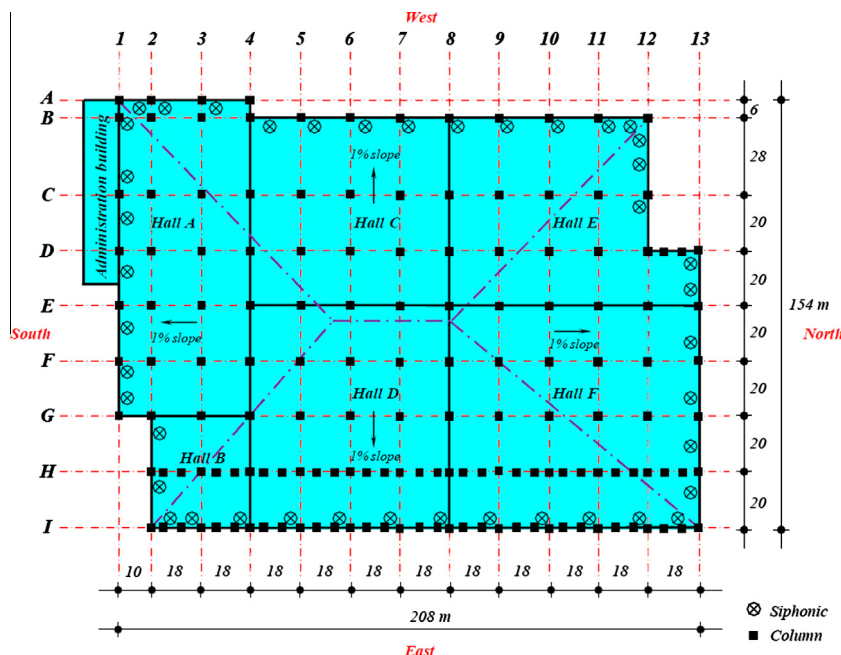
Scheme of the industrial structure subjected to ponding due to heavy rainfall.
